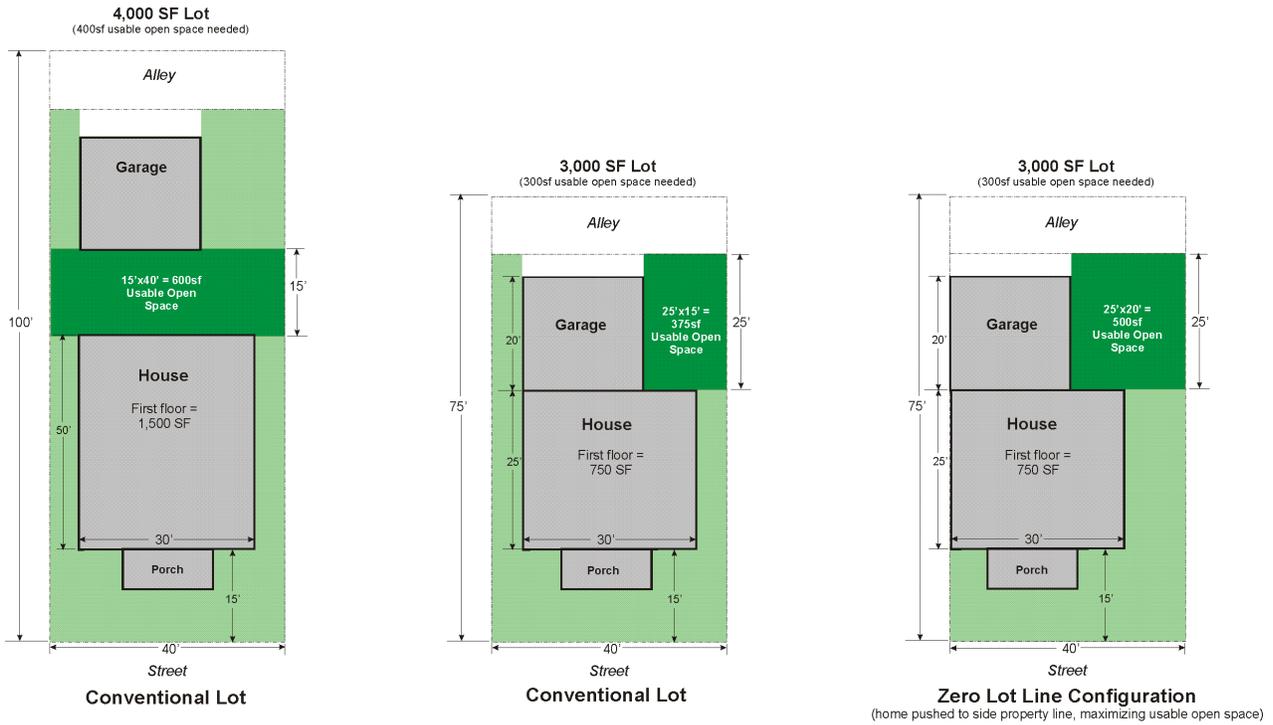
B.30.410b. Open space requirements for alley-loaded lots.
